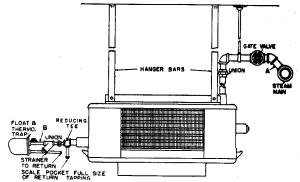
A—Typical piping connections for vertical air discharge unit heater.
